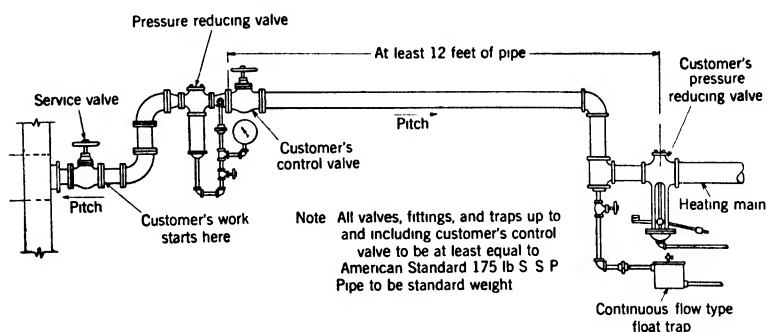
STEAM SUPPLY CONNECTION WHEN USING TWO REDUCING VALVES
